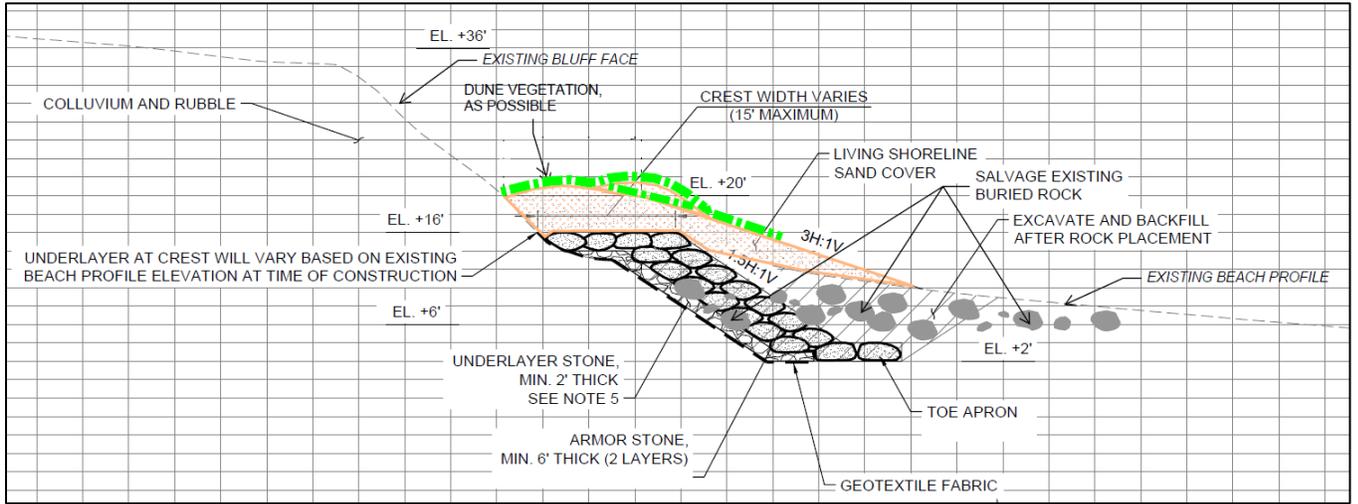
CONCEPTUAL PROPOSED STABILIZATION DESIGN – RESTROOM LOCATION
